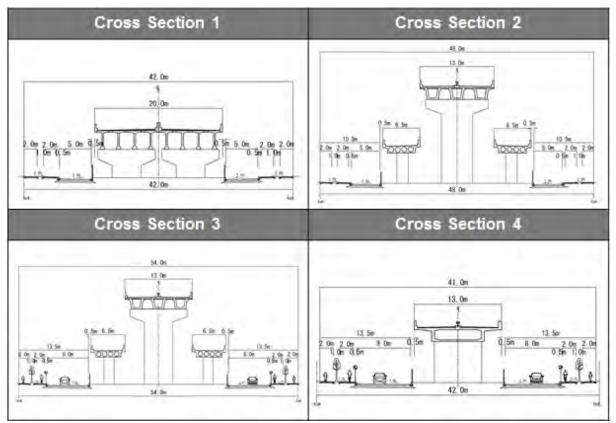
Typical Cross Section at Mombasa Island Street
